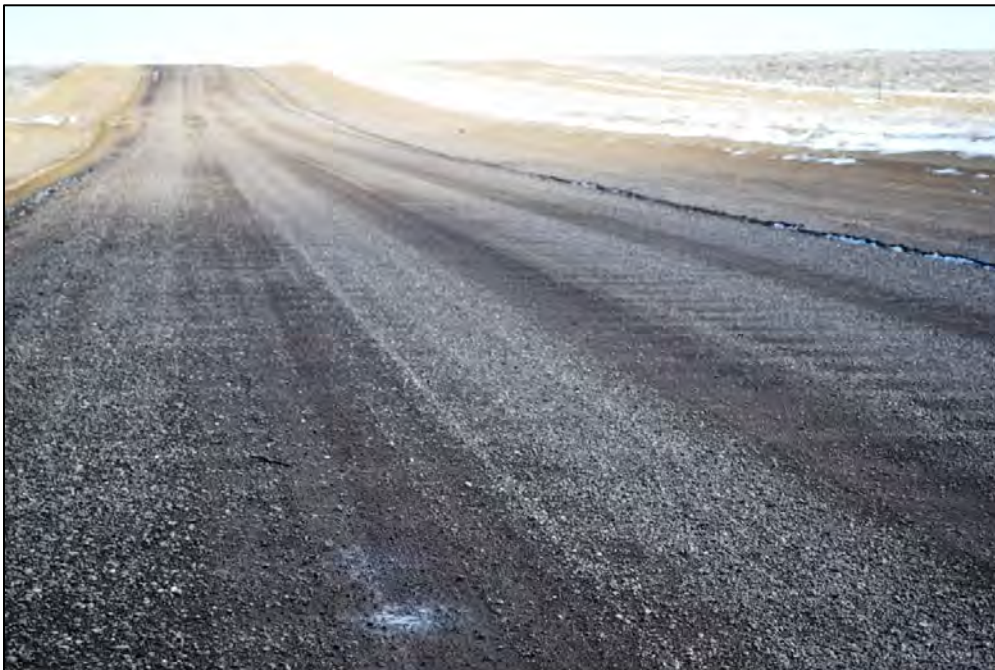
Road surface made from RAP blended with existing aggregate on segment K of Sweetwater County's Crooks Gap Road in April 2011, before application of dust suppressant.
